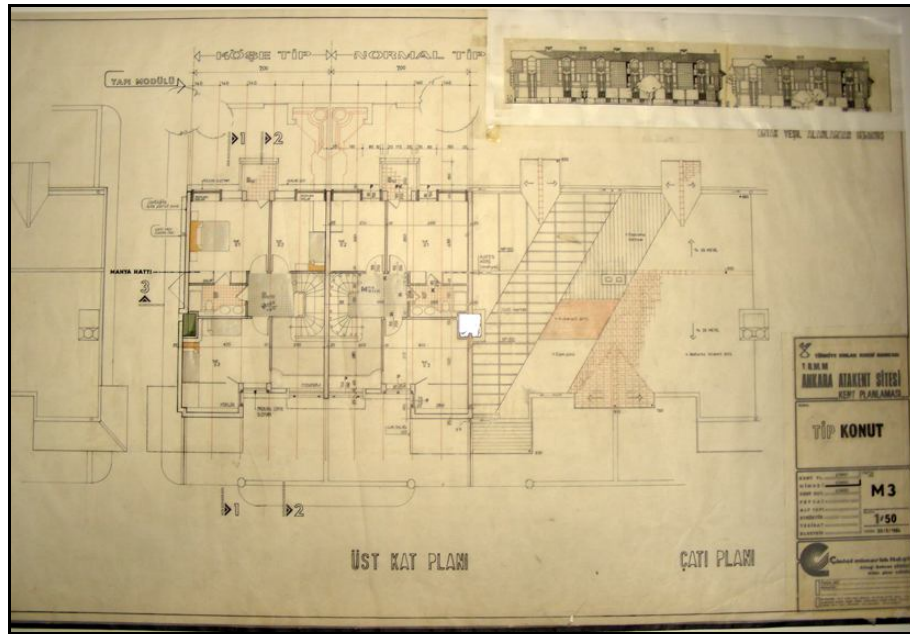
Second floor plan of the triplex unit. (From Çinici's archive.)
